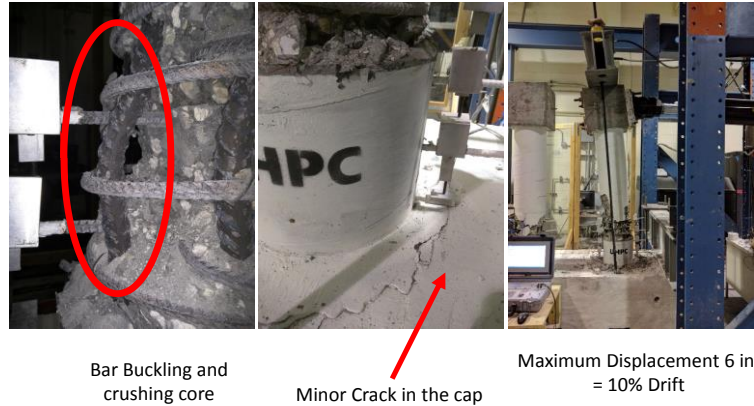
Failure pattern, rebar backing, crushing core concrete and location of the plastic hinge in the S-6-12
